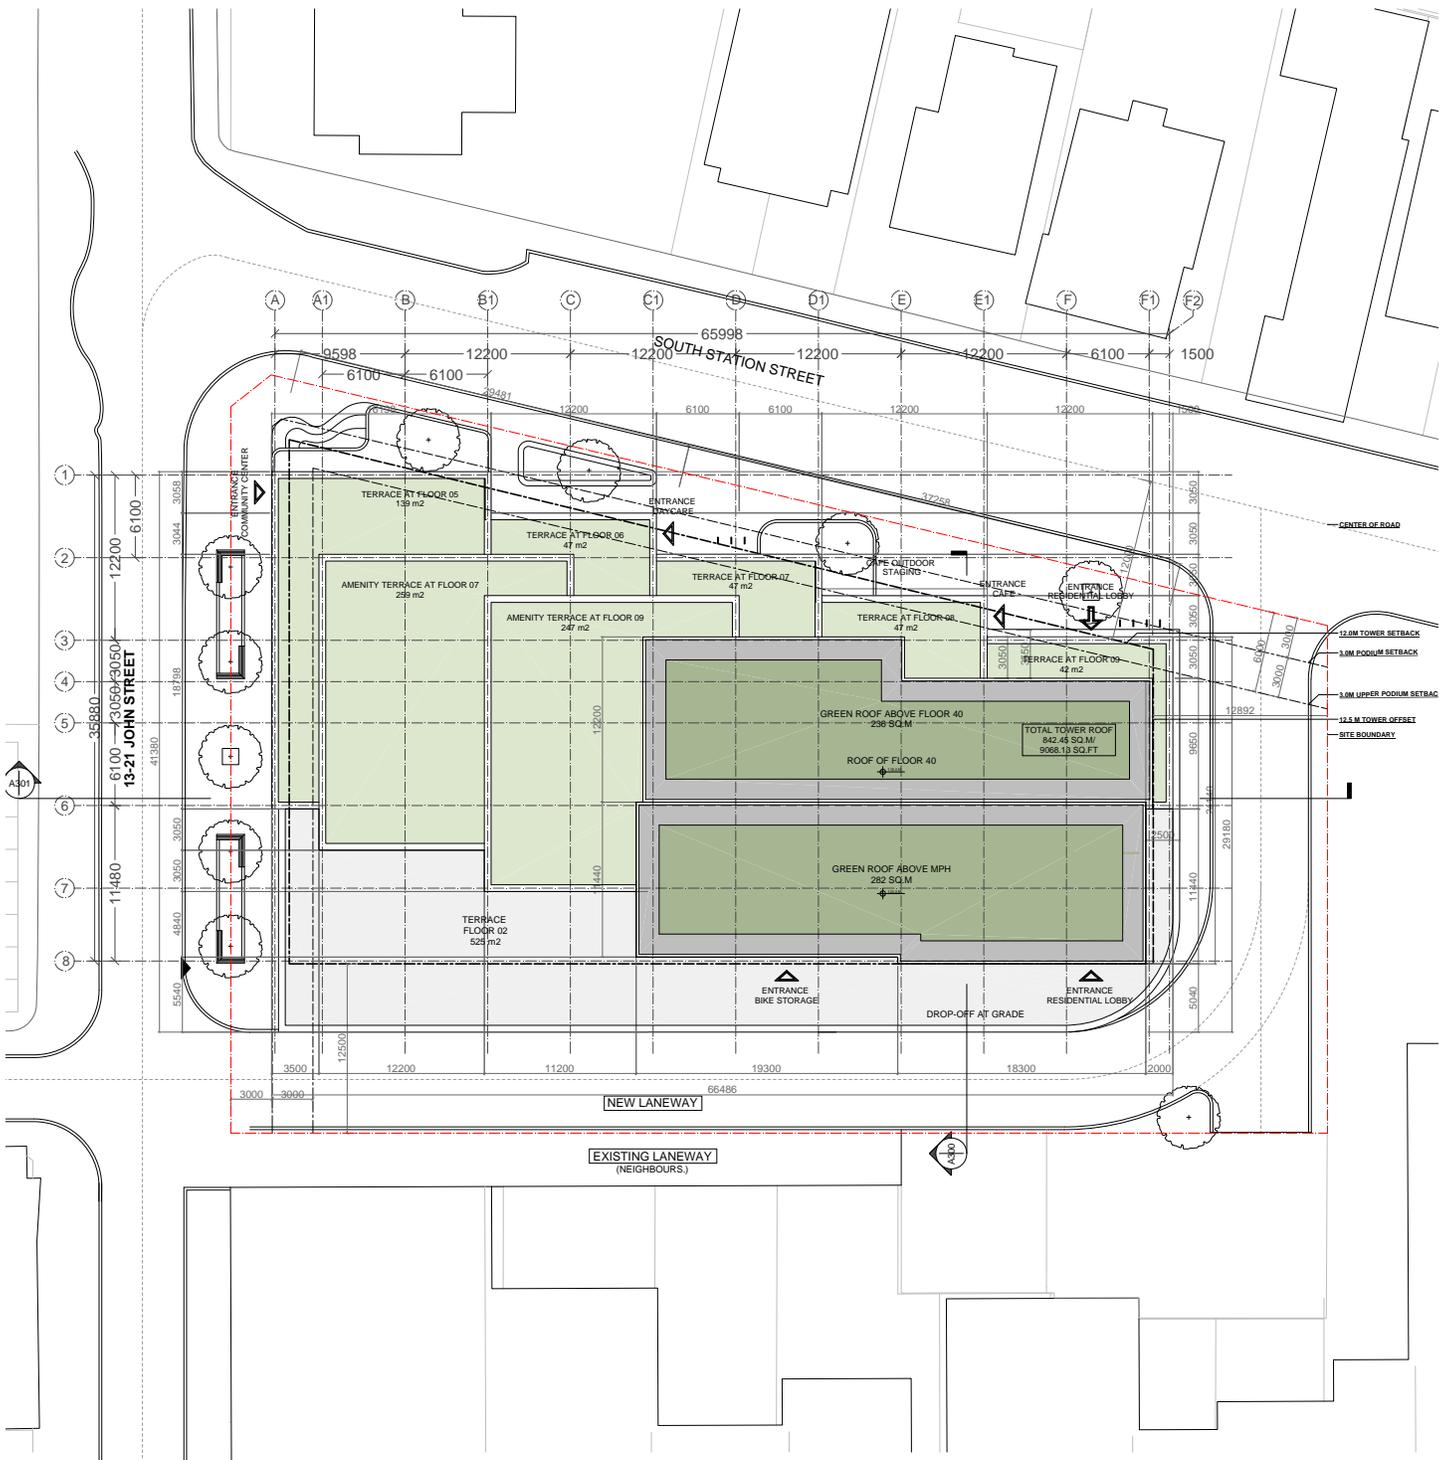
Roof Plan (Prepared by 3XN USA LLC)
